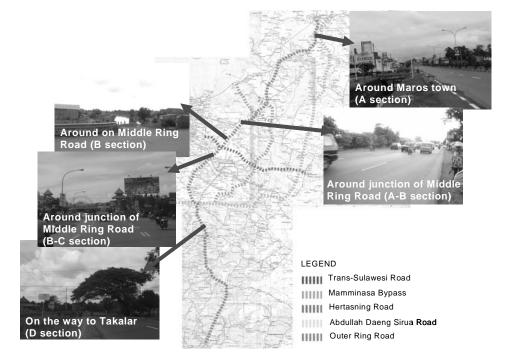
Typical Site Conditions of Trans-Sulawesi Road Mamminasata Section
